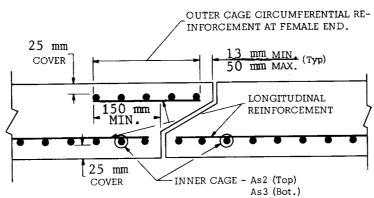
Section A-A Top and Bottom Slab Joint Reinforcement
